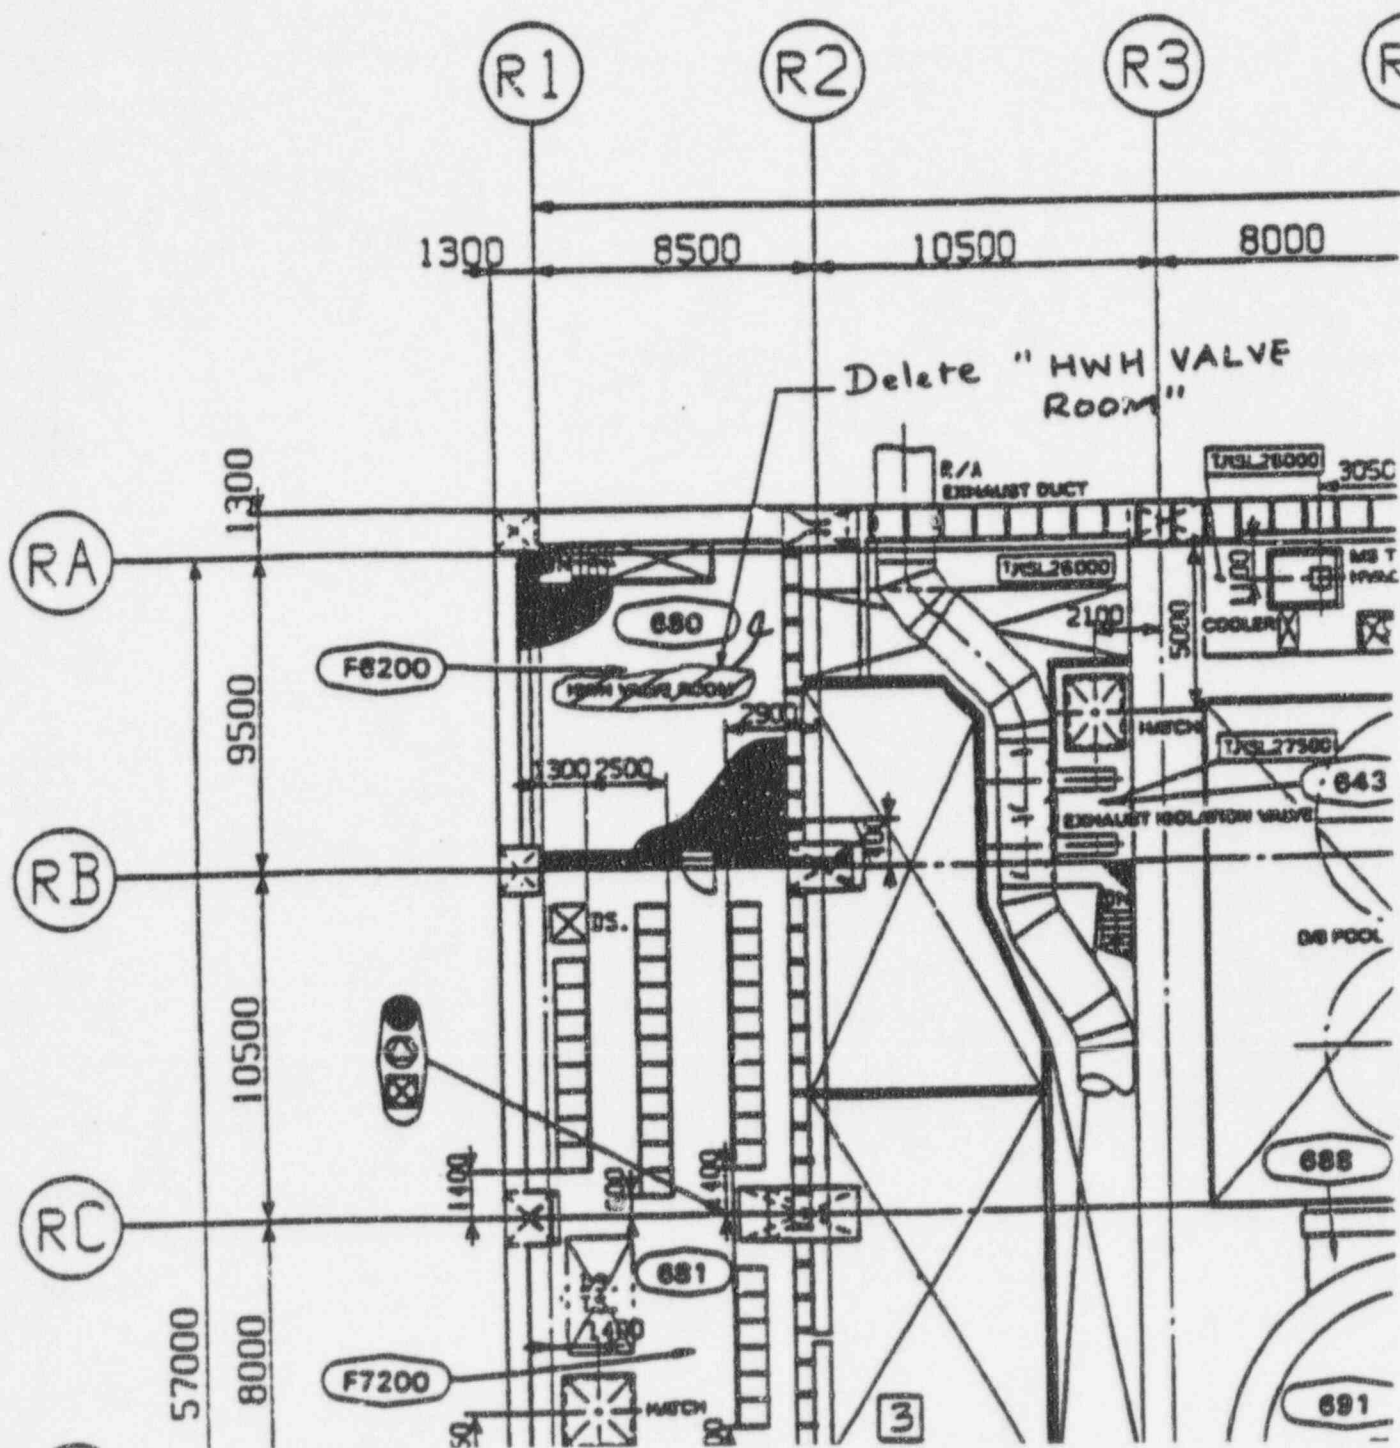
REACTOR BUILDING, ARRANGEMENT PLAN AT ELEVATION 27200mm
